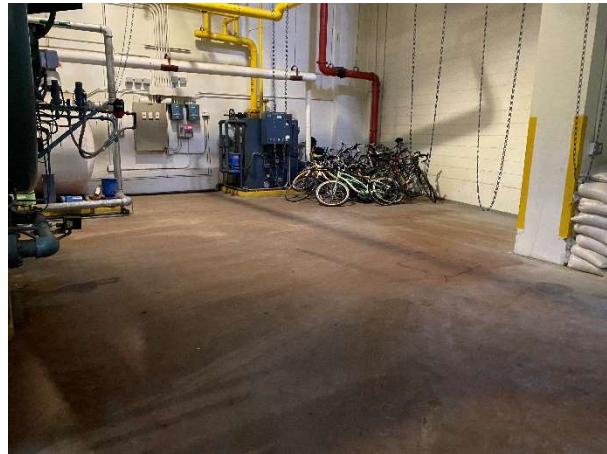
View slab in boiler room of 45-45 Center Blvd. (C241095)
